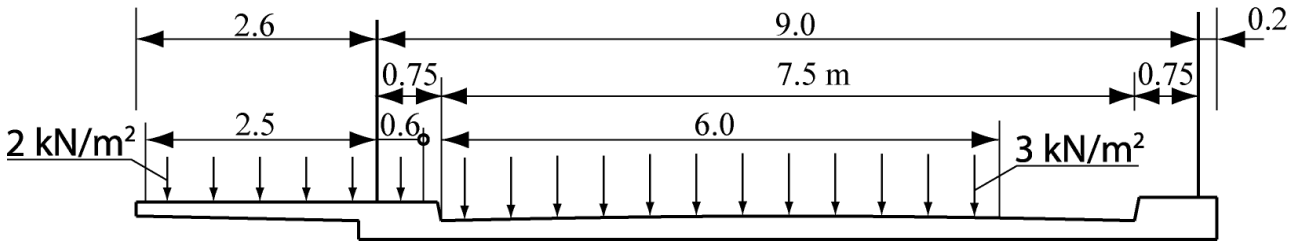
Live loads on the bigger arch of the Lonevaag Bridge.
